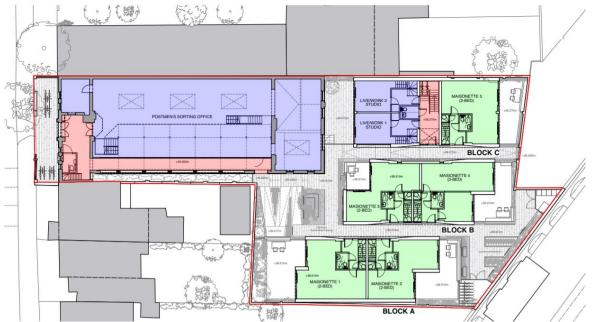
Proposed Site Plan (Ground Floor) from permitted scheme 2015/4778/P and 2015/4856/L
